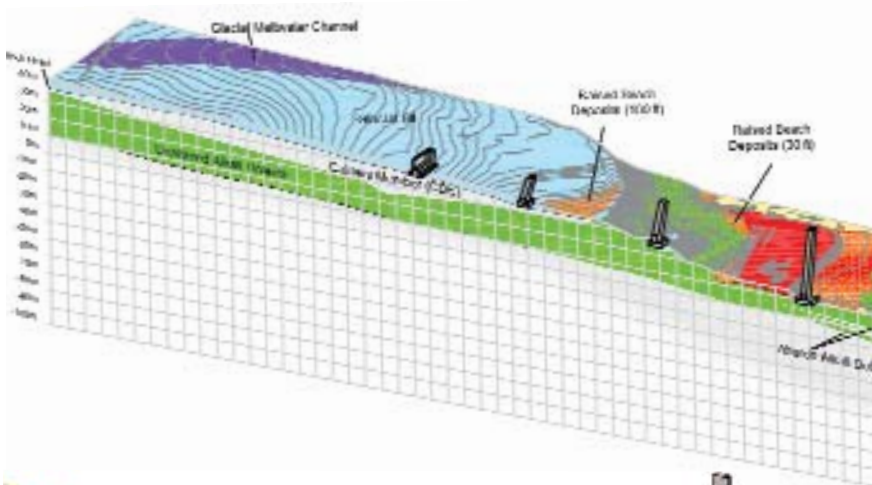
A ground model of the Southern Land Area, showing the sandstone (in grey) extending below the main crossing's south abutment and first viaduct pier
